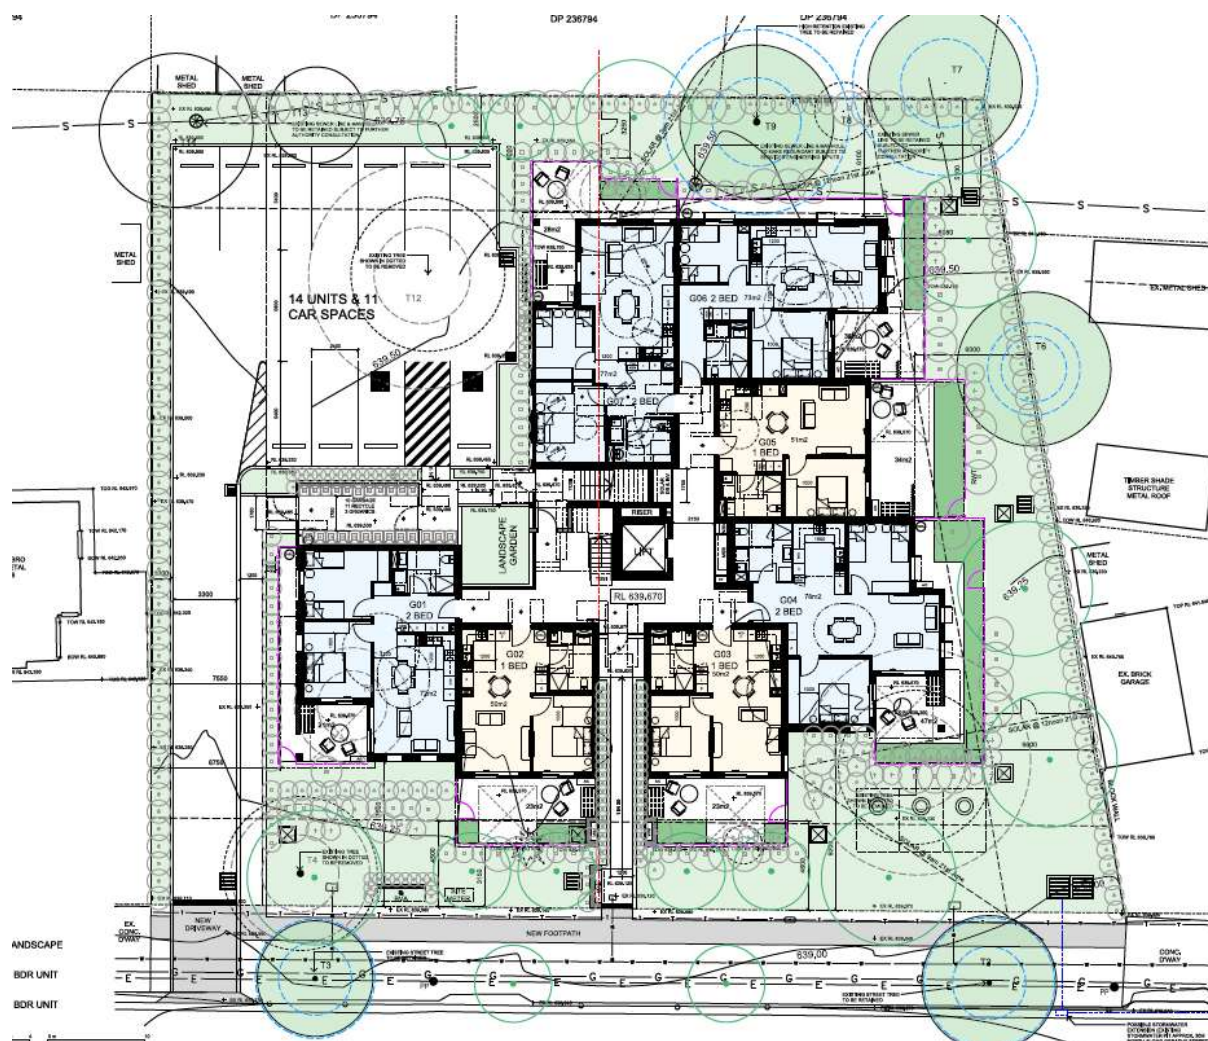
Parking Space (11 spaces) at Ground Floor
